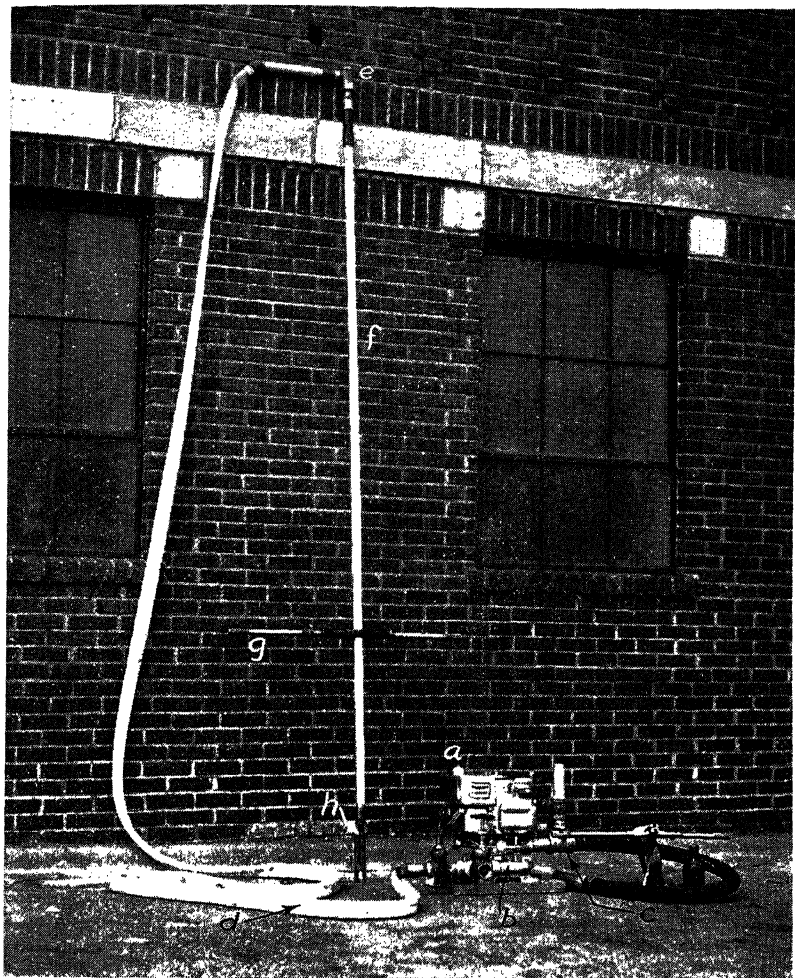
Hydraulic drill for fill material. *a*, two-cycle gasoline engine; *b*, centrifugal pump; *c*, pump intake; *d*, cotton hose; *e*, swivel head; *f*, drill pipe; *g*, handle for operator; *h*, nozzle.
